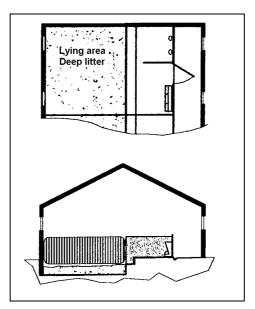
An example of a solid concrete floor system for growers-finishers [31, EAAP, 1998]
